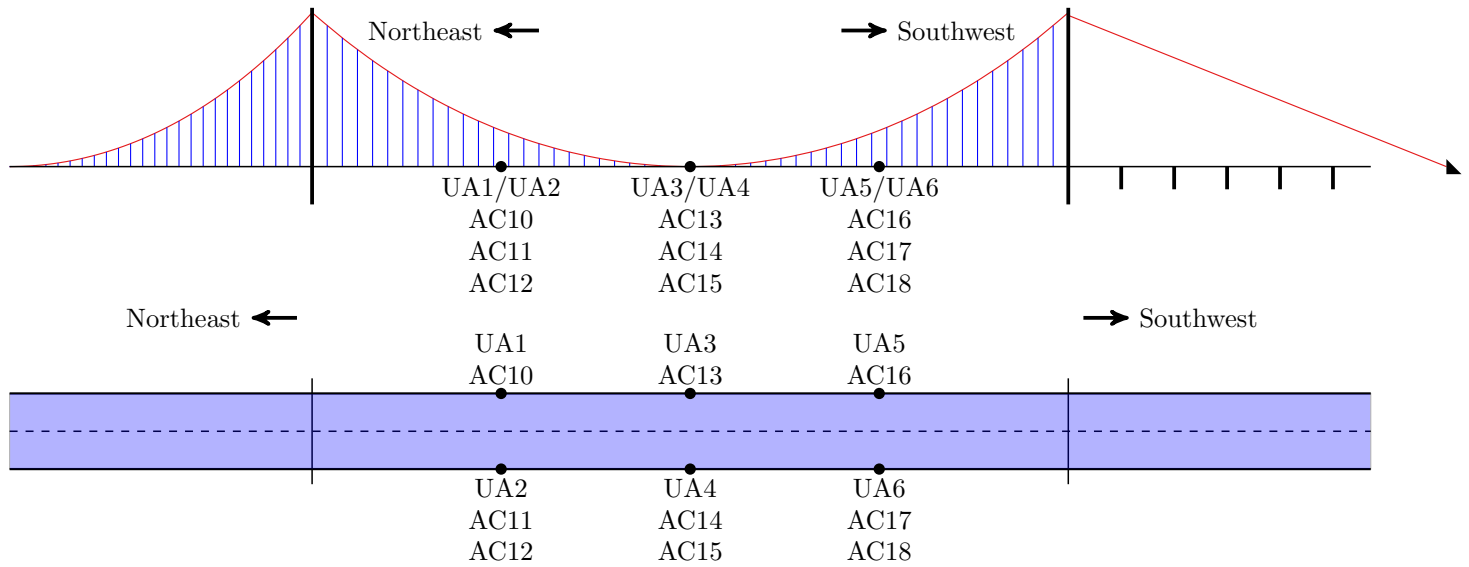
Elevation of Xihoumen Bridge and layout of monitoring points
